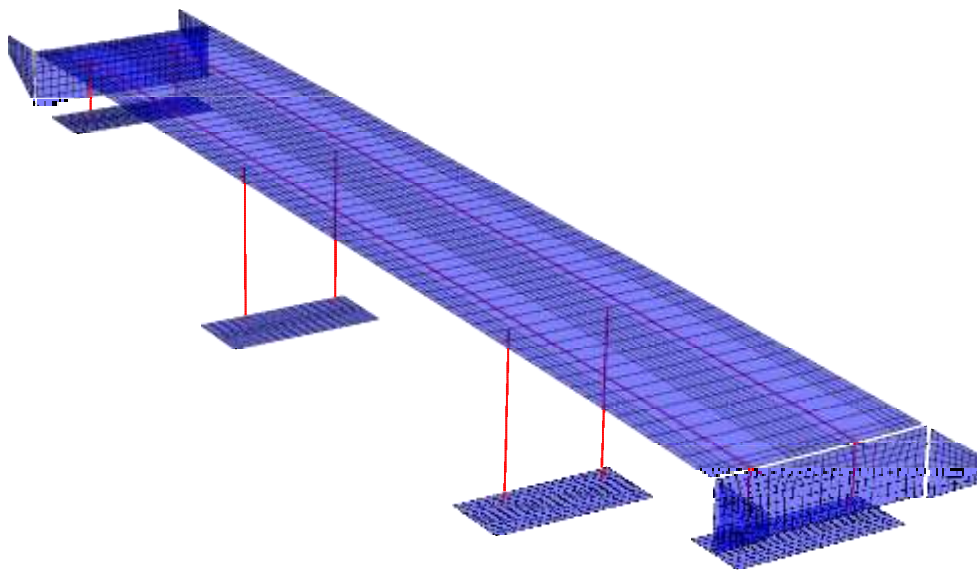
Example of finite element structural analysis model of a double beam bridge. Beam elements shown as lines (red) represent main beams and columns, shell elements shown as surfaces (blue) represent bridge deck, end shields, wing walls and foundation slabs
